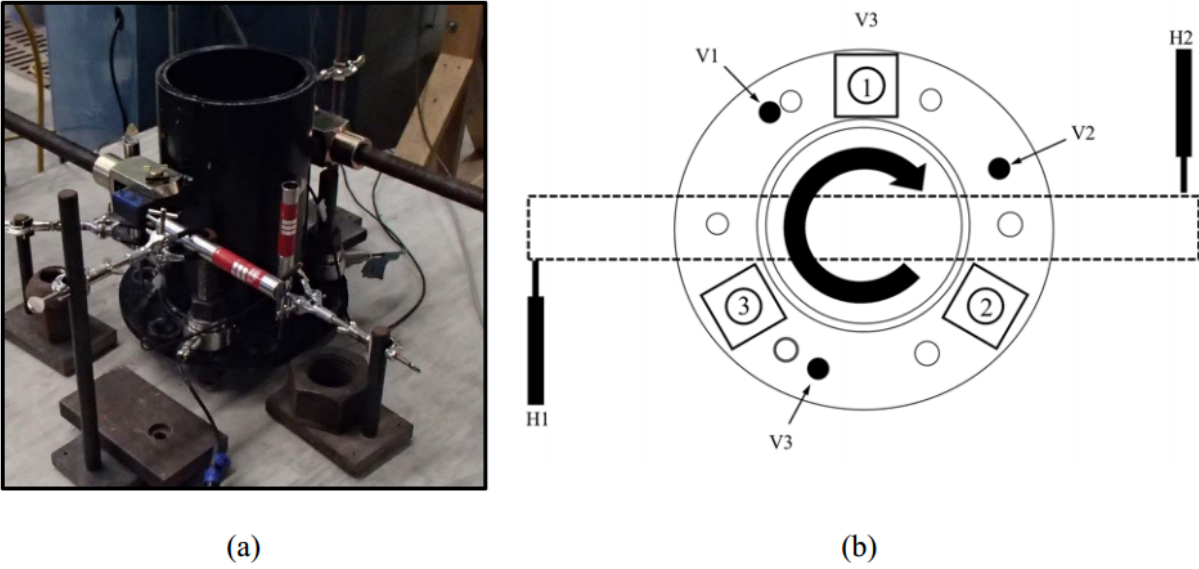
(a) Fully instrumented 25.4 mm [1 in.] torsion specimen and (b) plan view detail of base plate assembly bolt numbers and instrumentation
